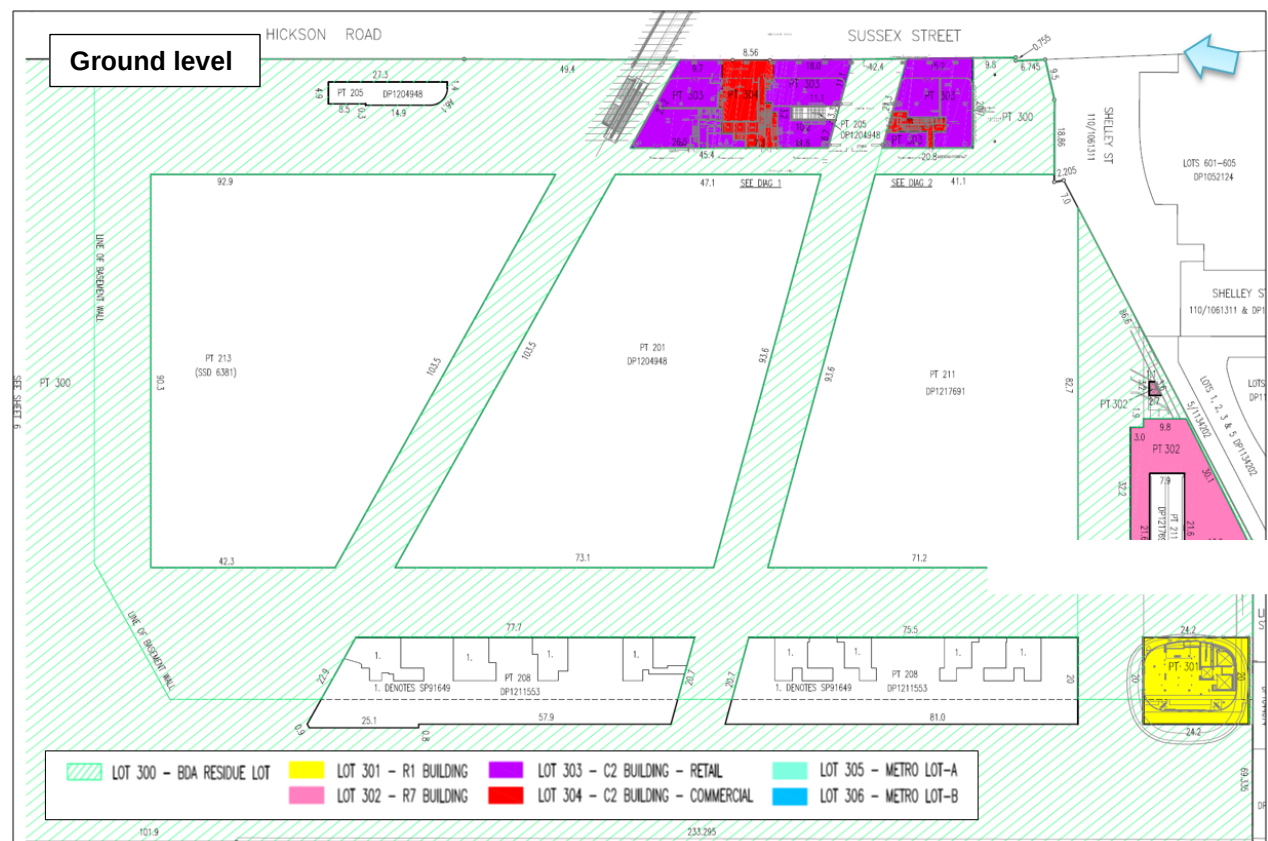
Proposed plan of subdivision for Stage 1A ground level at Barangaroo South (Source: EIS)
